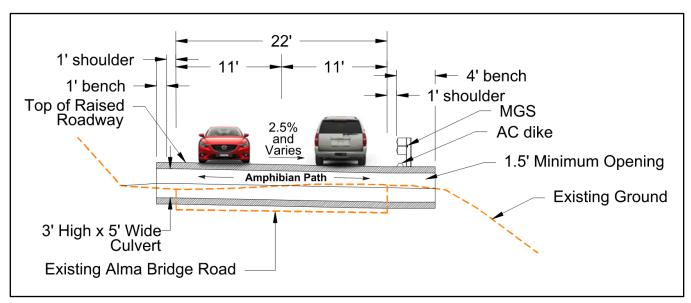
Typical Section #3 –Type 4 Purpose-built Passage Structure on Type 6 Elevated Road Segment (not to scale)
